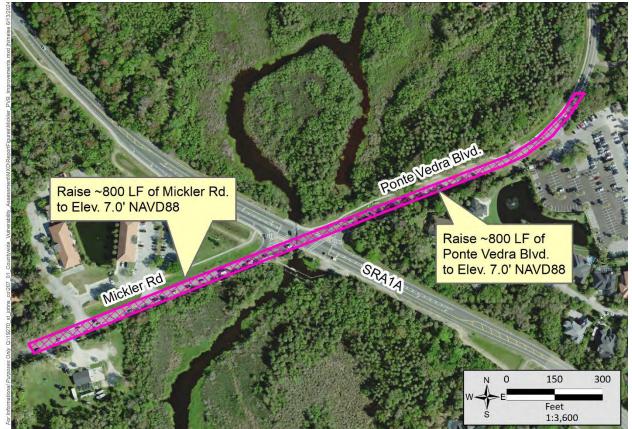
Proposed Improvements for Mickler Road and Ponte Vedra Boulevard
